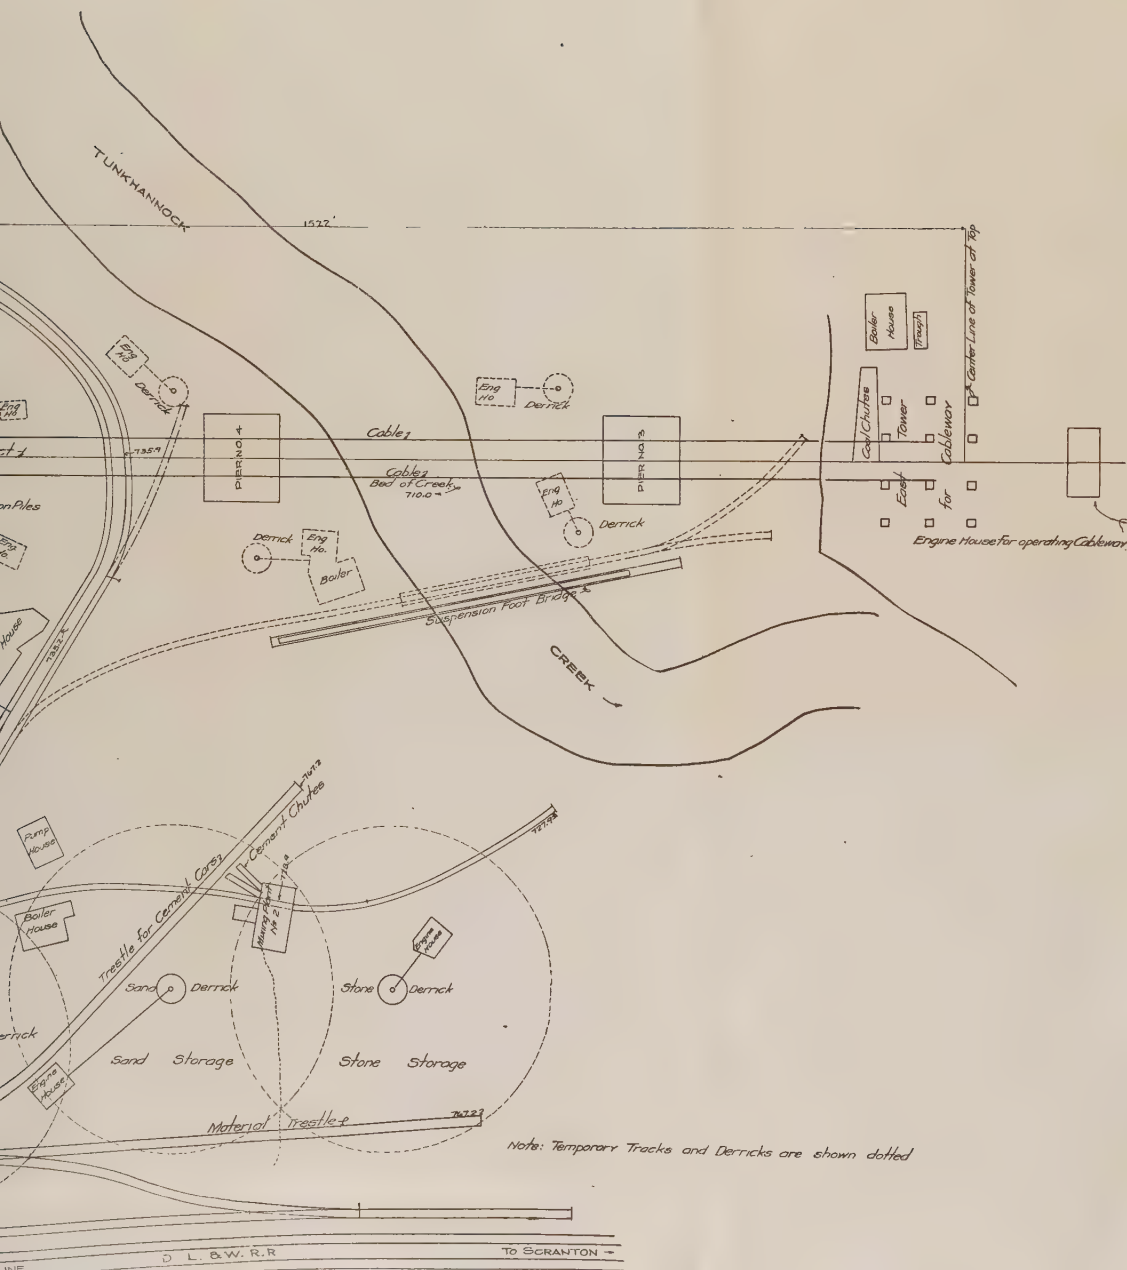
LAYOUT OF CONSTRUCTION PLANT.
